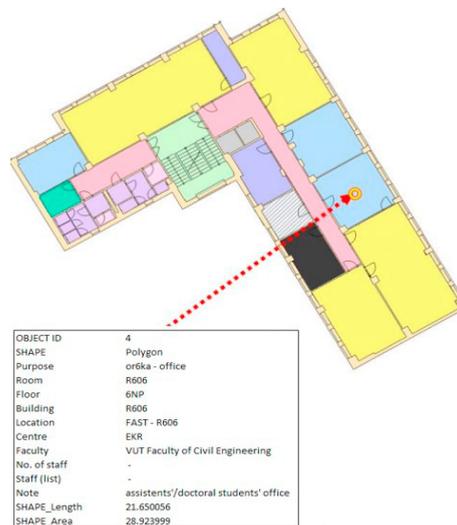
Example of “Orientation Plan” layer information (Source: authors’ own processing)
